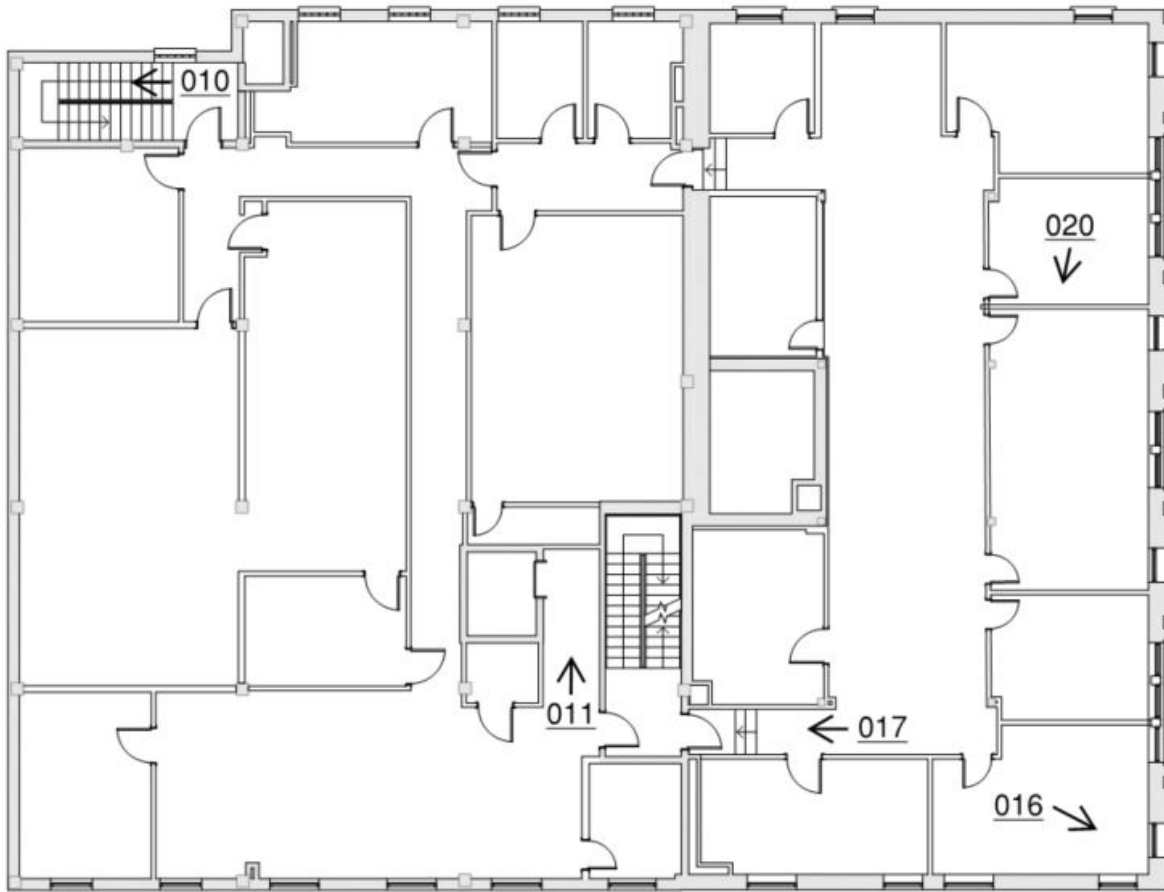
Second Floor Photographic Key Plan. Alley Poyner Macchietto Architecture, Omaha, Nebraska, 2021
